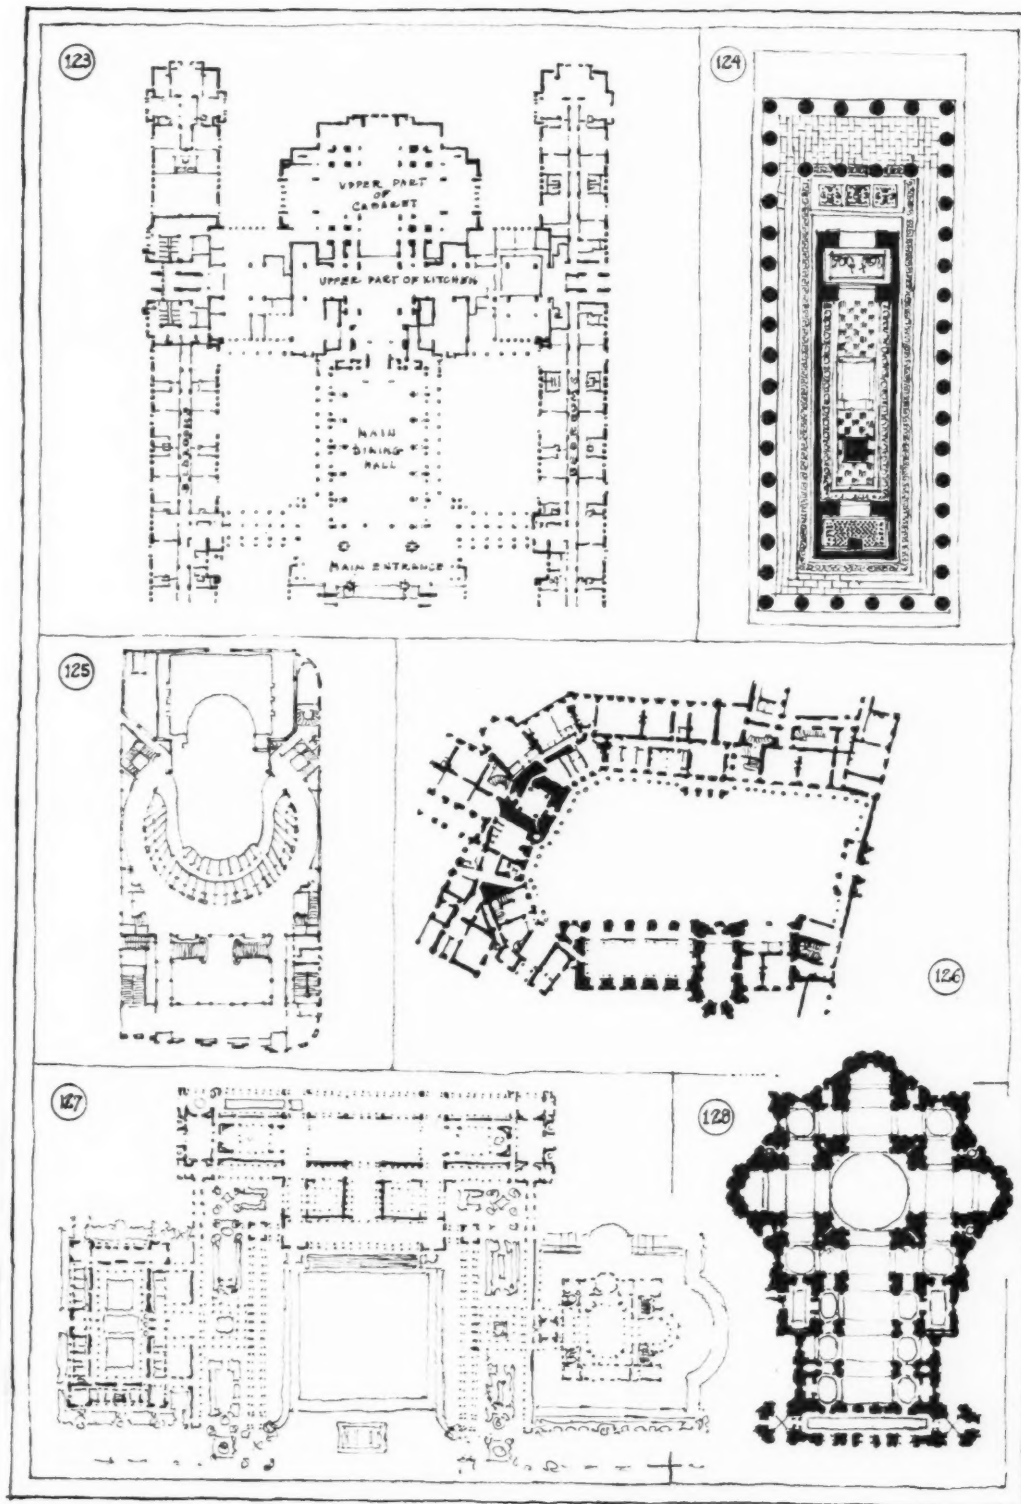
Imperial Hotel, Tokio, by Frank Lloyd Wright. The plan lay-out reveals the simple rectangular modern construction in reinforced concrete with main points of support and thinner curtain walls. Note the difference in weights of walls, expressions of the varying spans and character of the plan divisions.
